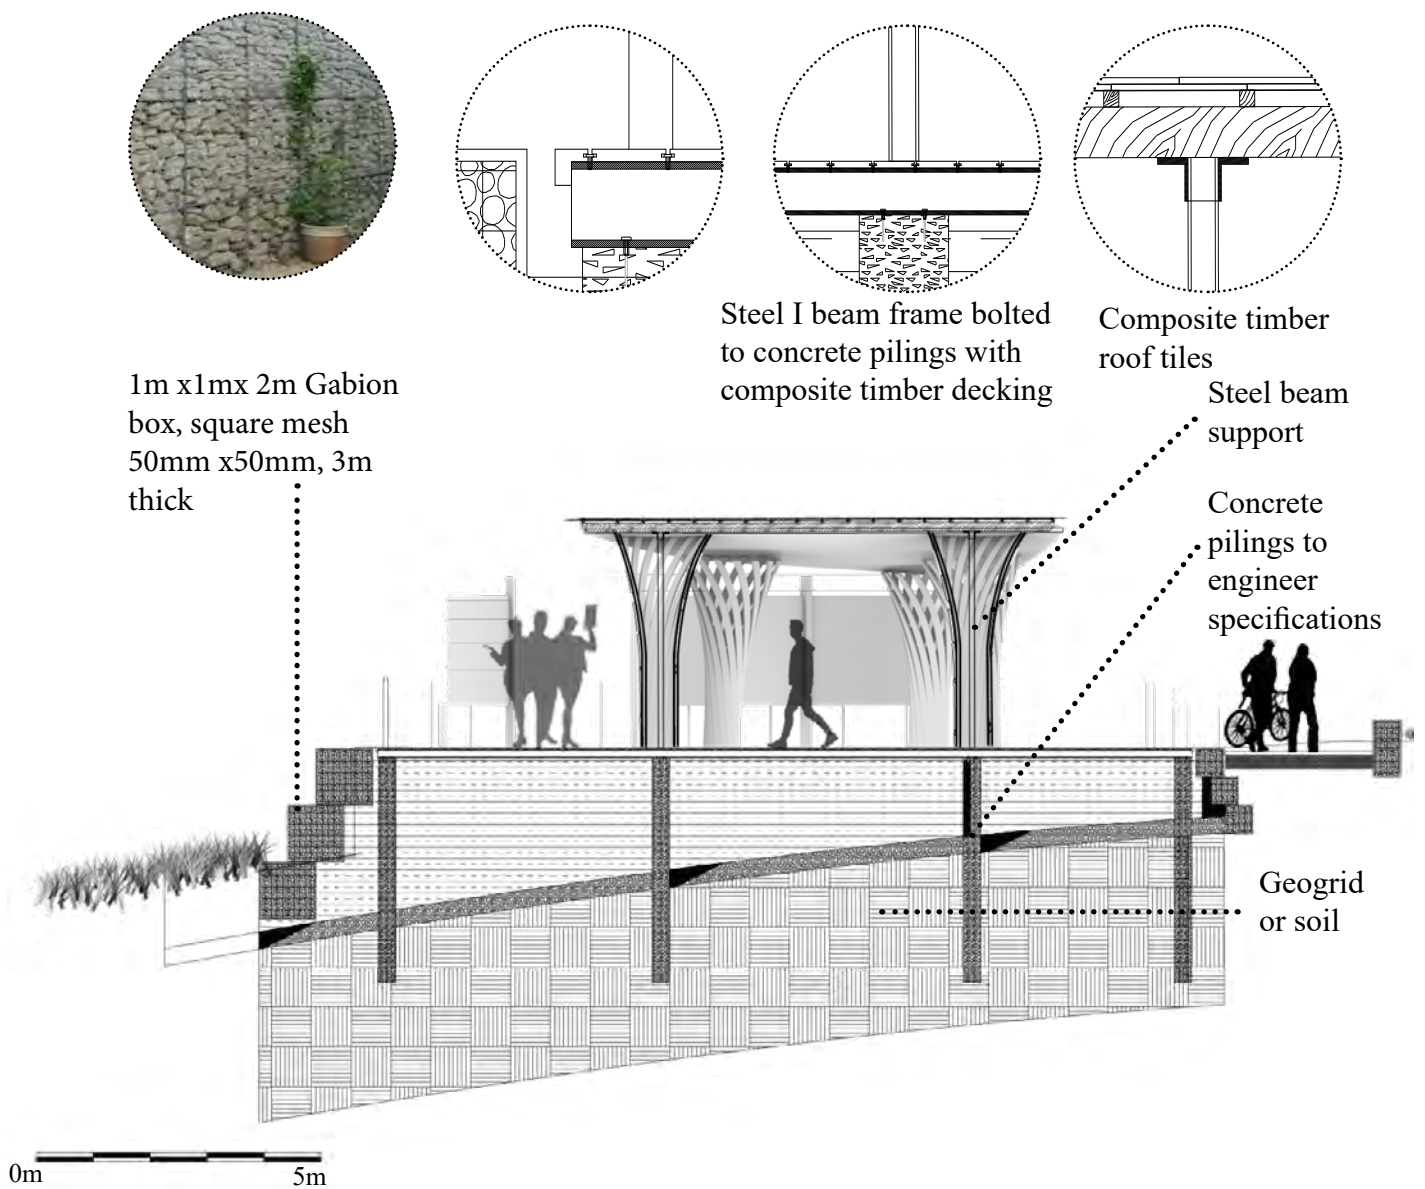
Foundations for construction on a landfill site (Author, 2020)
